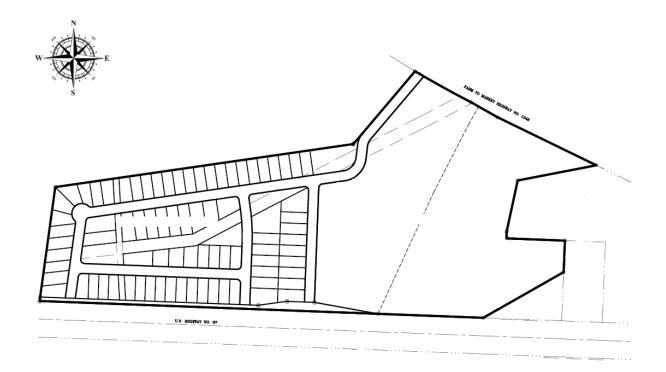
Site Plan for Proposed NP Homes Subdivision with Proposed Driveways
